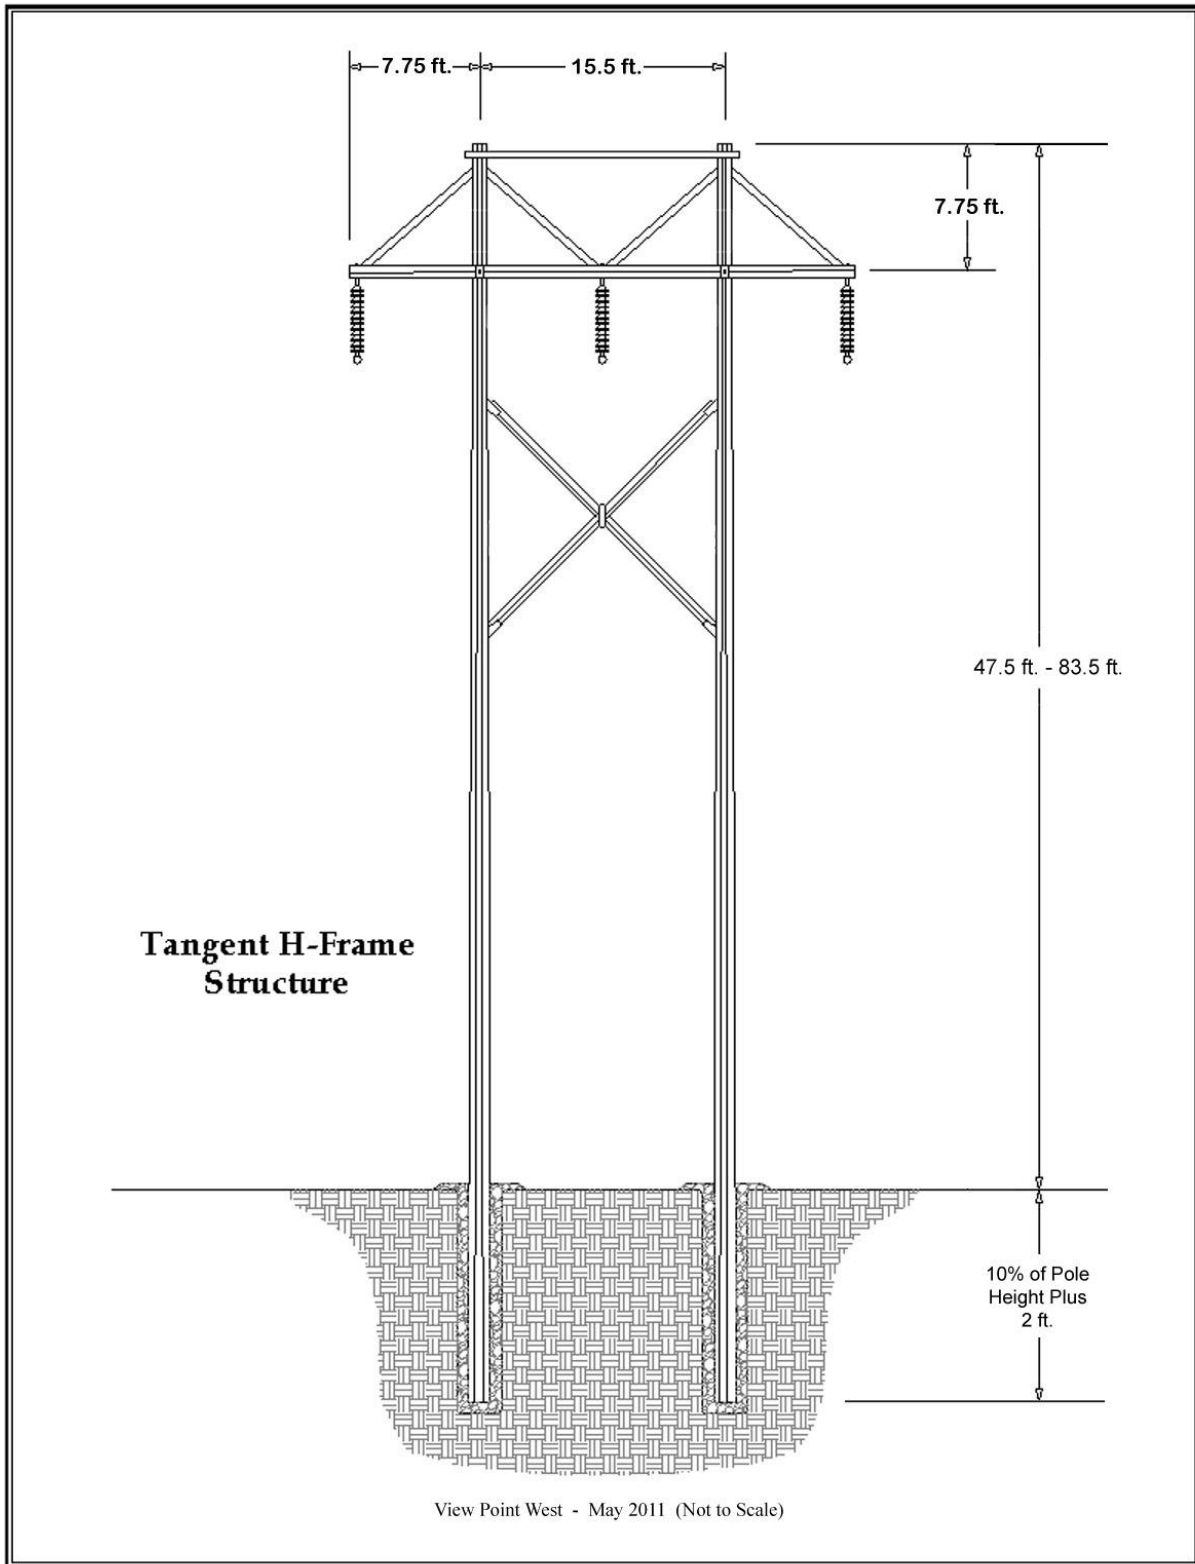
Typical 115 kV H-frame Wood Pole Structure
